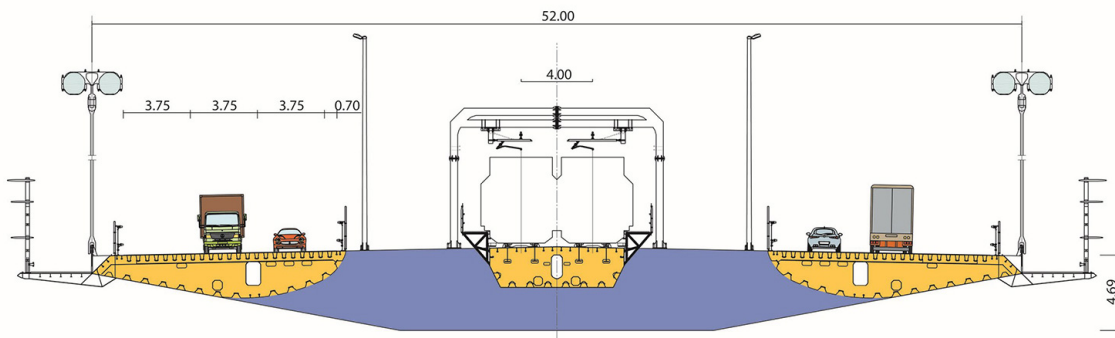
Multi-box deck-section of the Messina Bridge
